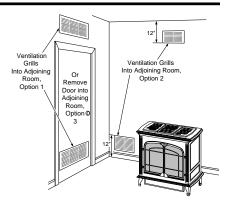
Ventilation Air from Inside Building (Oxford™ Stove Model Shown)
